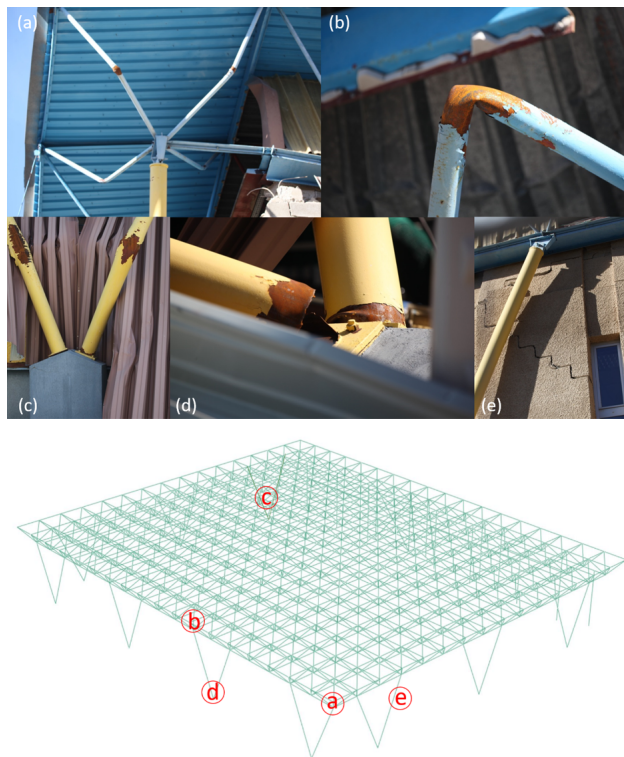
Close-up views of damage to the structure of the Irstea Cévennes hall, as observed on March 18, 2018: buckling and bending failure of roof tubular profiles (a,b), bending and shear failures of tubular supporting pylons (c,d) and cracking of the inner offices' walls made of concrete and located along the southern face of the building.
